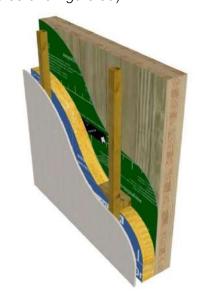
CLT wall build-up with wrap, timber battens, insulation, and cladding/lining [5].
